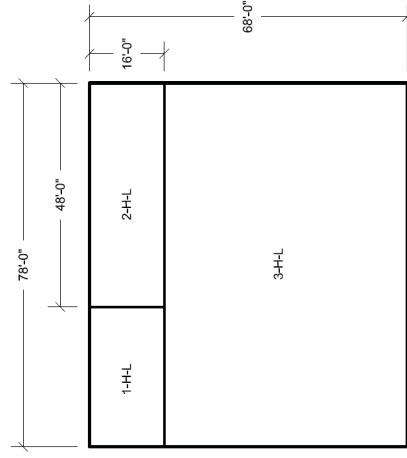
H.6.55: PUMP HOUSE NORTH WALL LOOKING SOUTH
